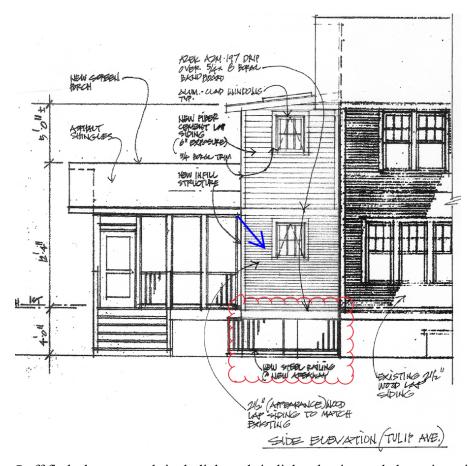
View of the proposed south elevation. The blue arrow points to the proposed wood lap siding with a 2½" reveal. Staff recommends replacement of this siding with cementitious siding with a 6" exposure. The area noted with the red cloud shows the foundation that requires a note about material.
